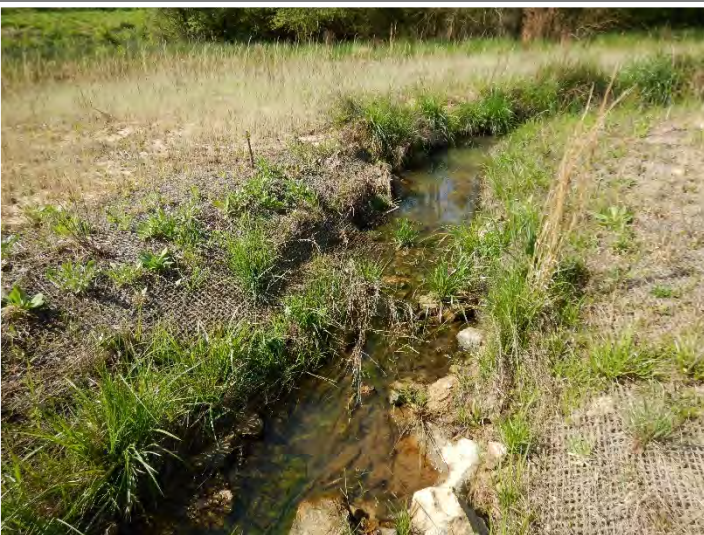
T6B – downstream (4/7/2020)
